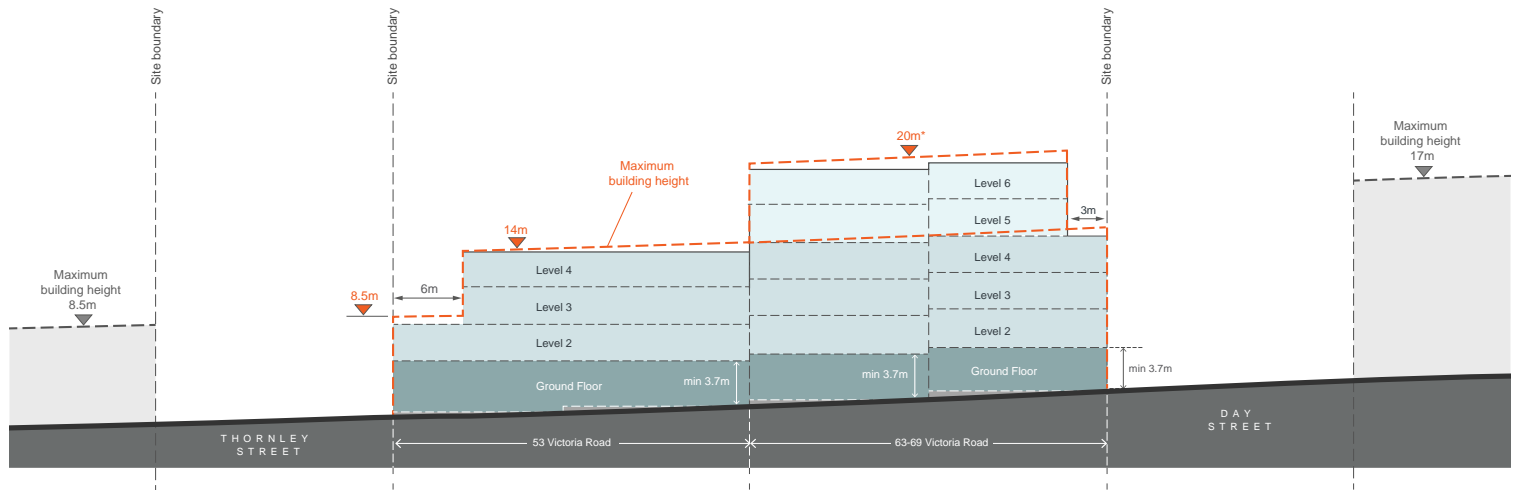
Area 'H' Elevation 1 Victoria Road
